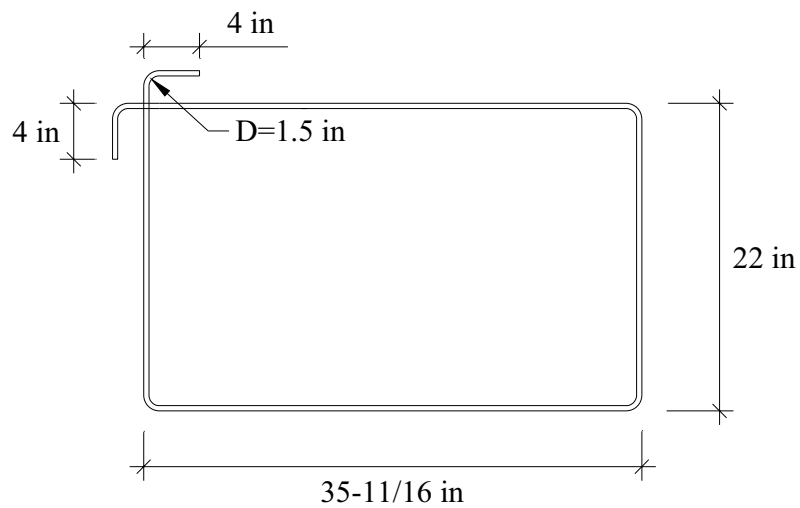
Section A-A; Detail Overlapping Tie (A) #3; Specimens H1 & H2
